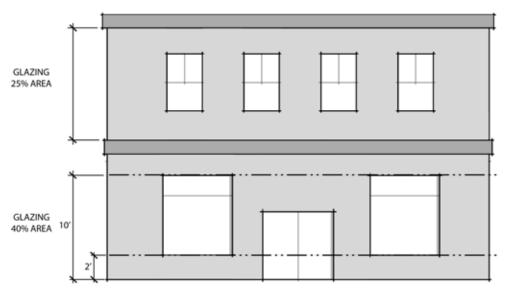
Commercial or mixed use building meeting glazing requirements
